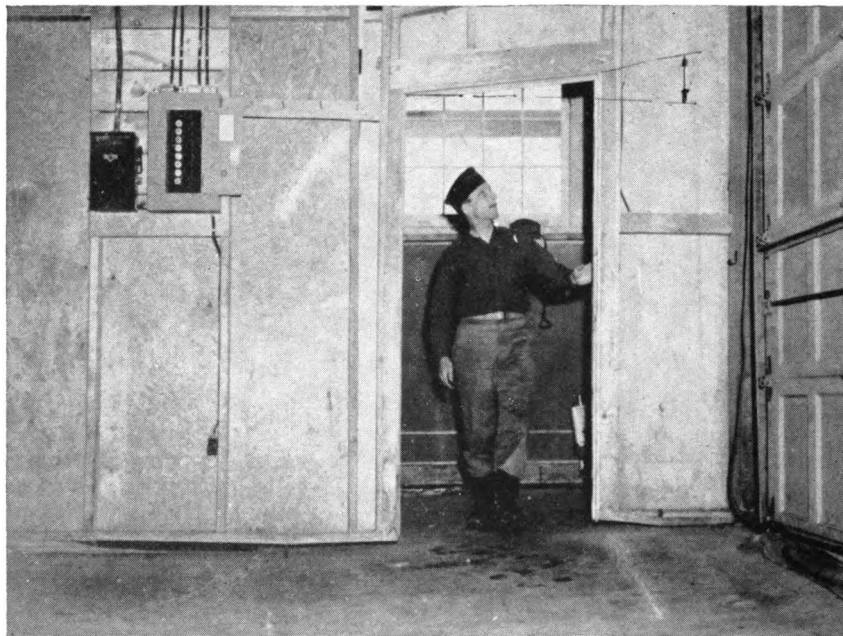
Garage at Northway Airfield, showing settling due to improper construction on permafrost.
